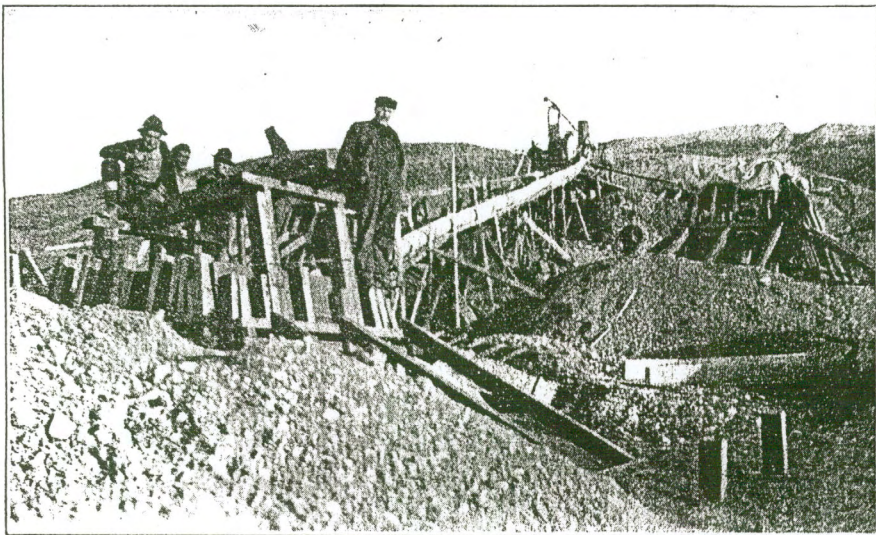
Concrete Mixer and Spouting Outfit on East Slope of Judith River Viaduct.
